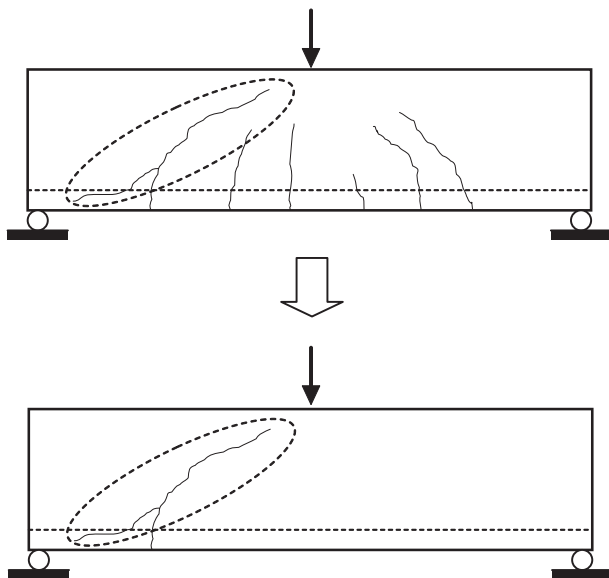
Diagonal tension failure by the formation of a dominant, unstable shear crack
